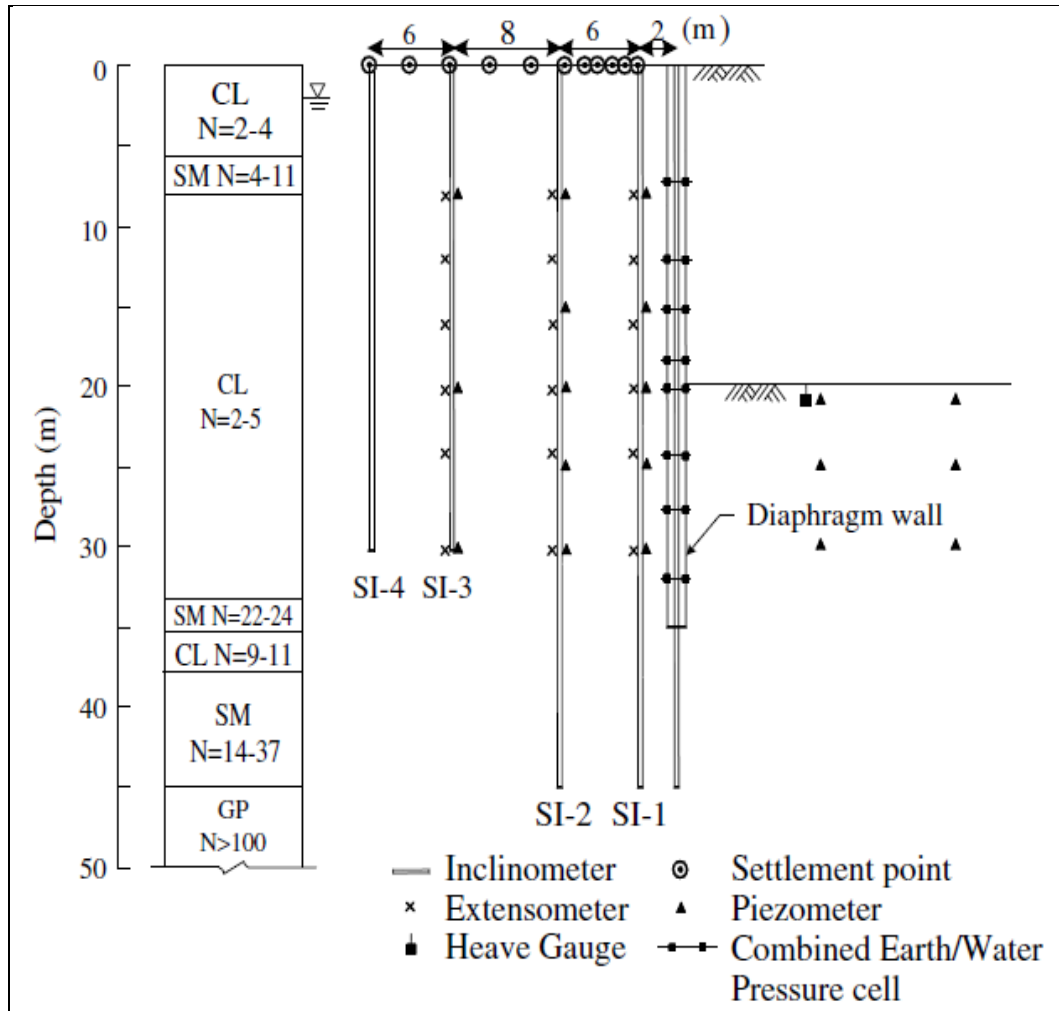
Underground condition and arrangement of instrumentation [7]
